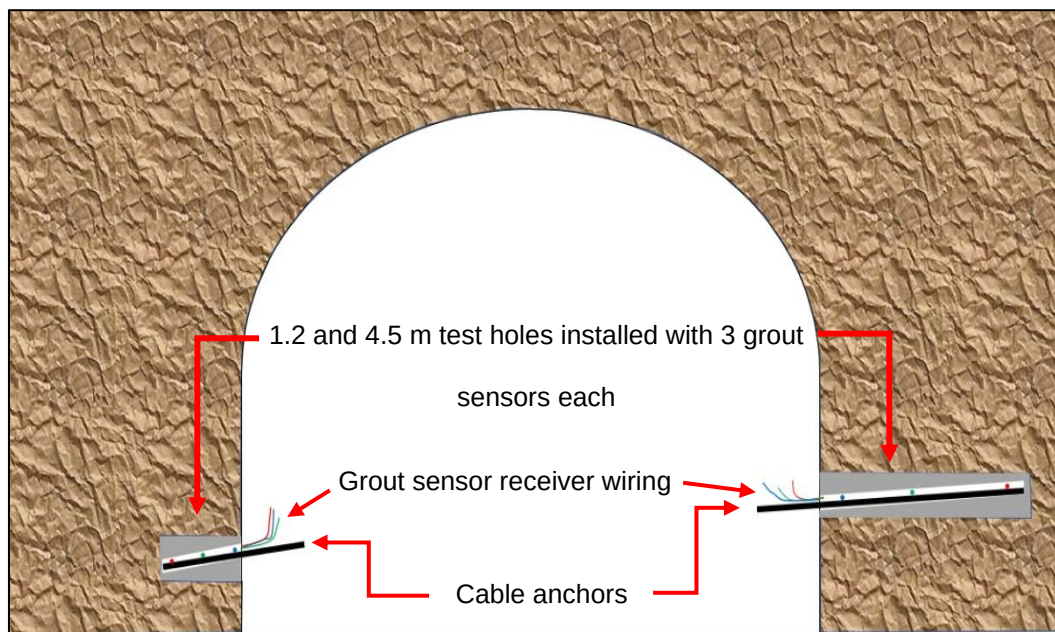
Diagram of the underground 1.2 m and 4.5 m support test holes.
